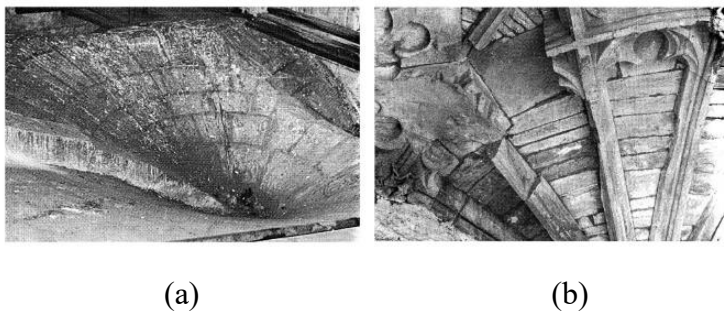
Construction of fan vaults: (a) Fan vault constructed from jointed masonry (extrados view) and (b) Fan vault constructed from horizontal panels and vertical ribs holding them; intrados view (photos from Leedy 1980).
